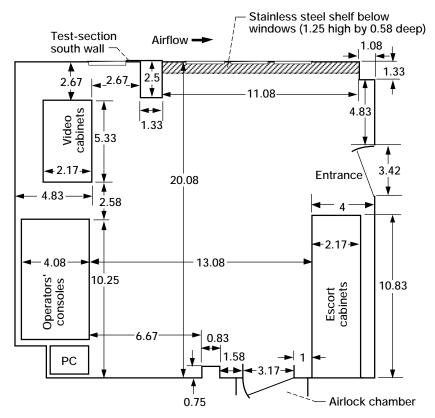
Floor plan of IRT primary control room (all dimensions are given in feet).
